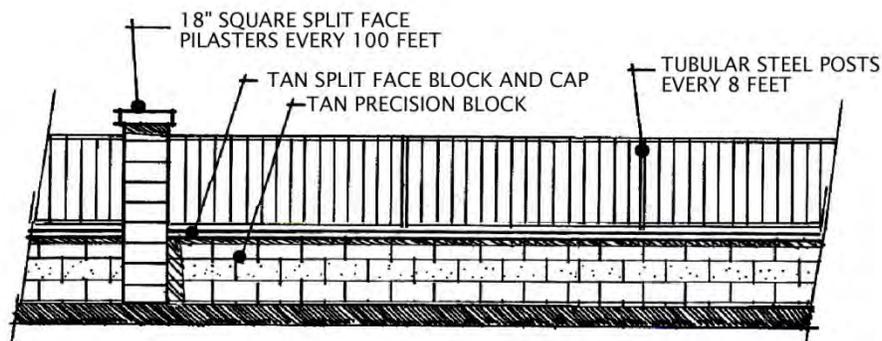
Combination masonry and tubular steel wall with decorative finish
